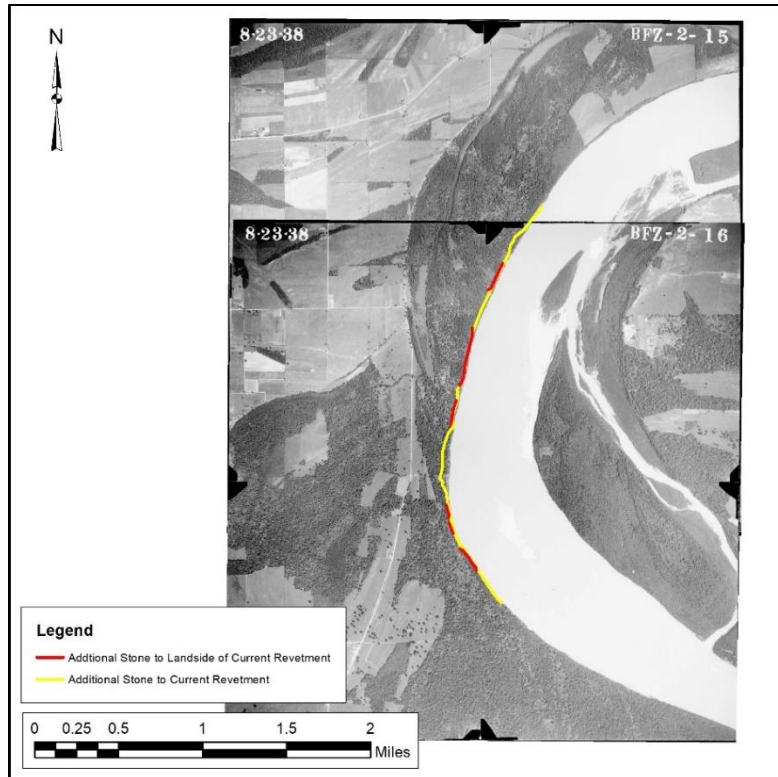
Plan of proposed revetment modifications (1938 aerial photo).
